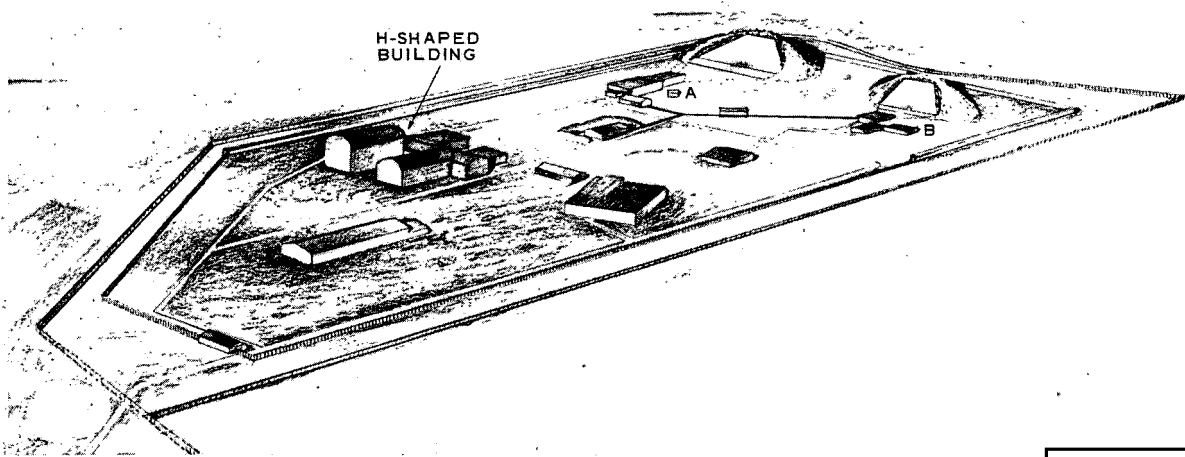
ARTIST'S CONCEPT OF TEST FACILITY, KRASNOYARSK, USSR.
